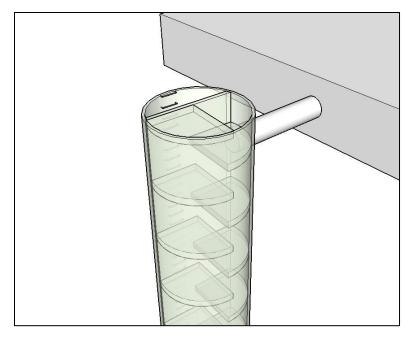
3D Baffle Drop Structure Design Component (Source: Danny Hsieh 2017)
